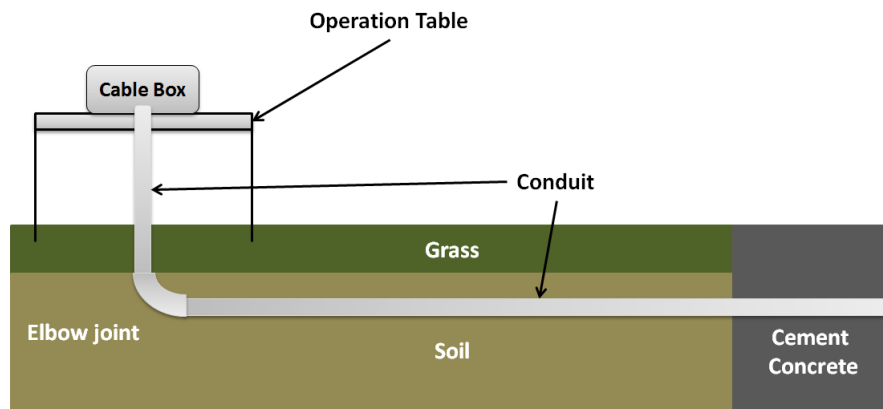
Chart. The layout of routing the cable through the PVC conduit. After installation of the eight energy harvest devices in the rigid pavement is accomplished, epoxy was cast to fill the trenches to the same level with pavement surface (Figure 132).
